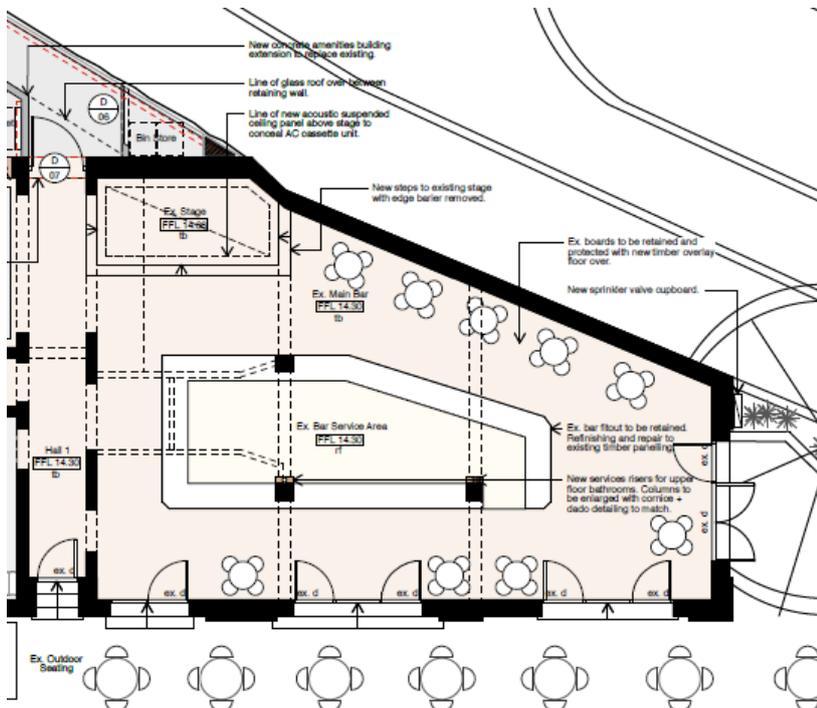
Extract of floor plans with a focus on the ground floor bar area
